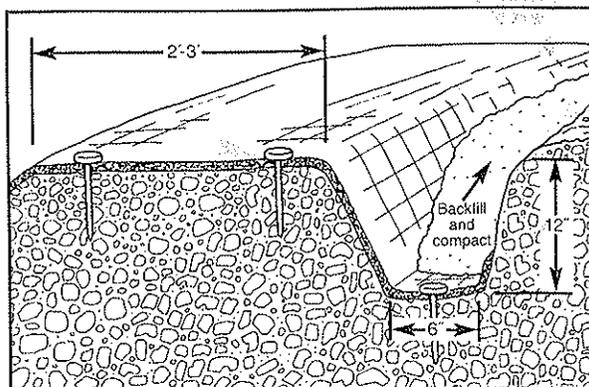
Longitudinal anchor trench detail (trapezoidal channel)
